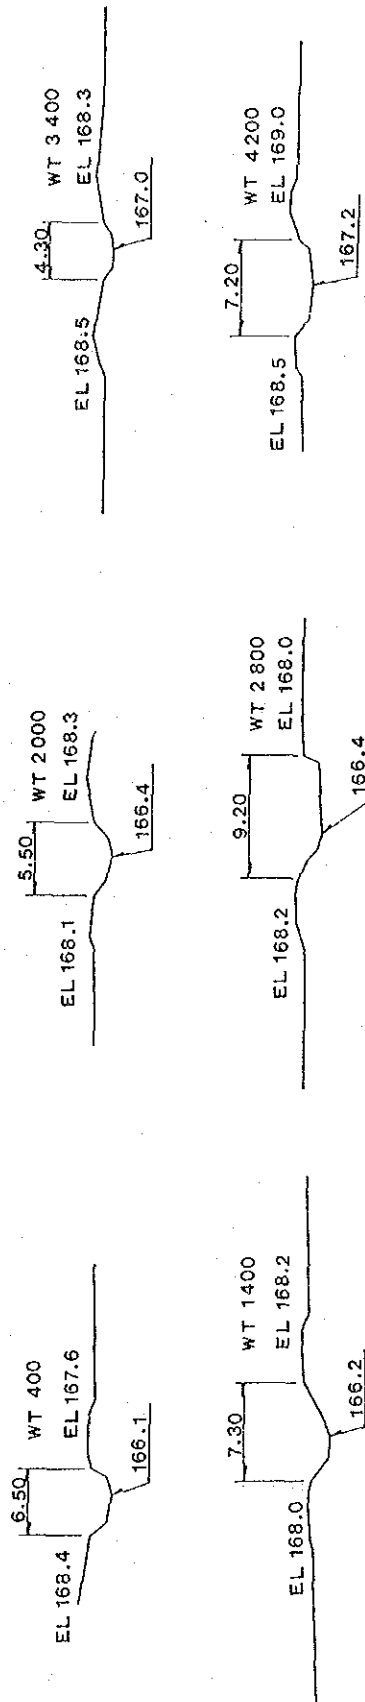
(6) Longitudinal Profile and Cross Section (Hong Kai Keo)
